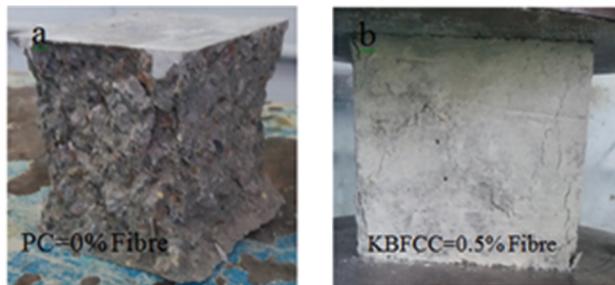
Failure mode of (a) PC cube specimen, (b) KBFCC cube specimen under compressive load.
